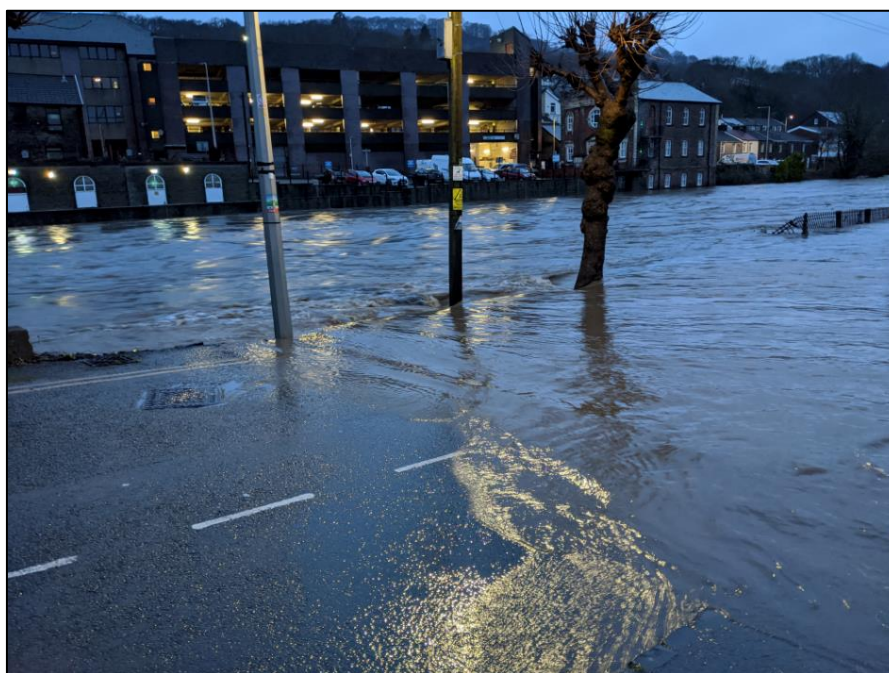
Collapsed river wall at the southern end of Sion Street, near Bridge Street, during Storm Dennis (image provided by resident)
